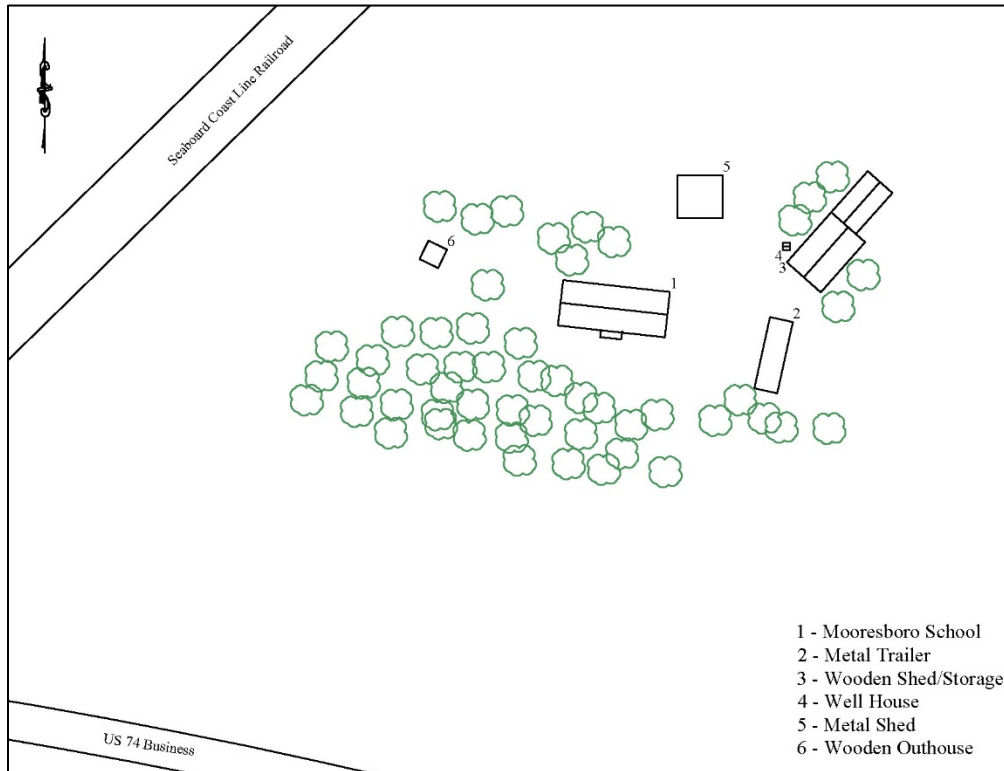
Site plan of the (former) Mooresboro School property, not to scale.
